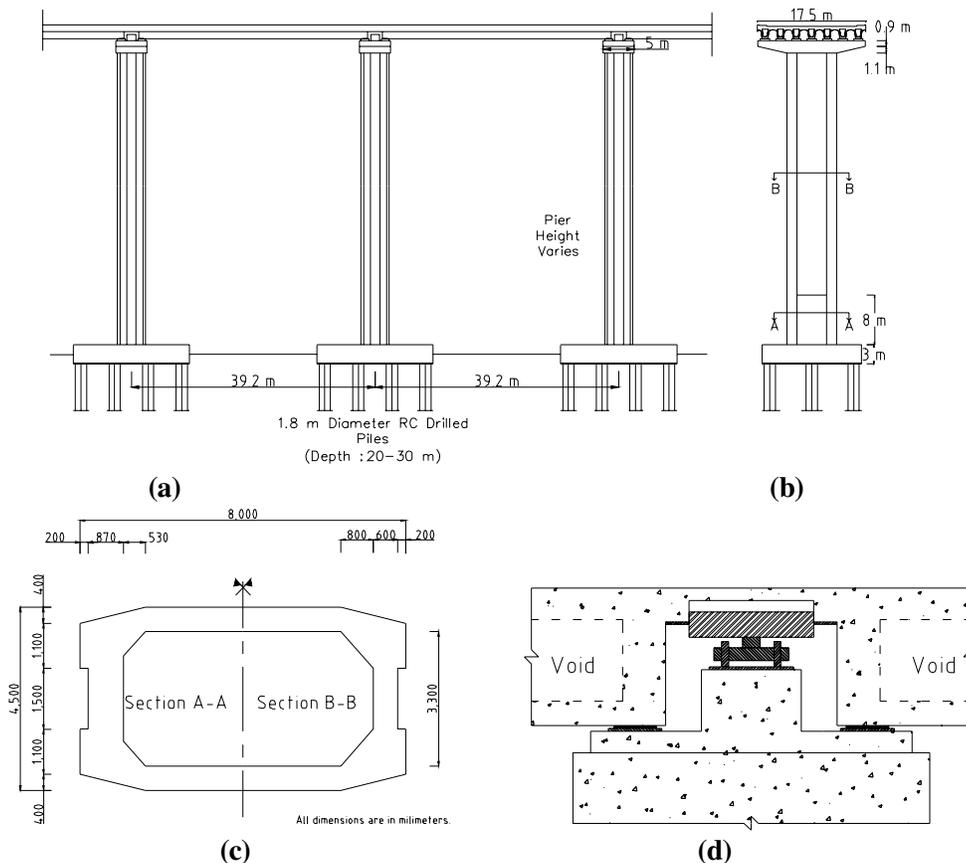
Dimensions and details of the Bolu Viaduct. a) Side view, b) Transverse direction c) Pier cross sections, d) Side view of the joint between the deck and piers
